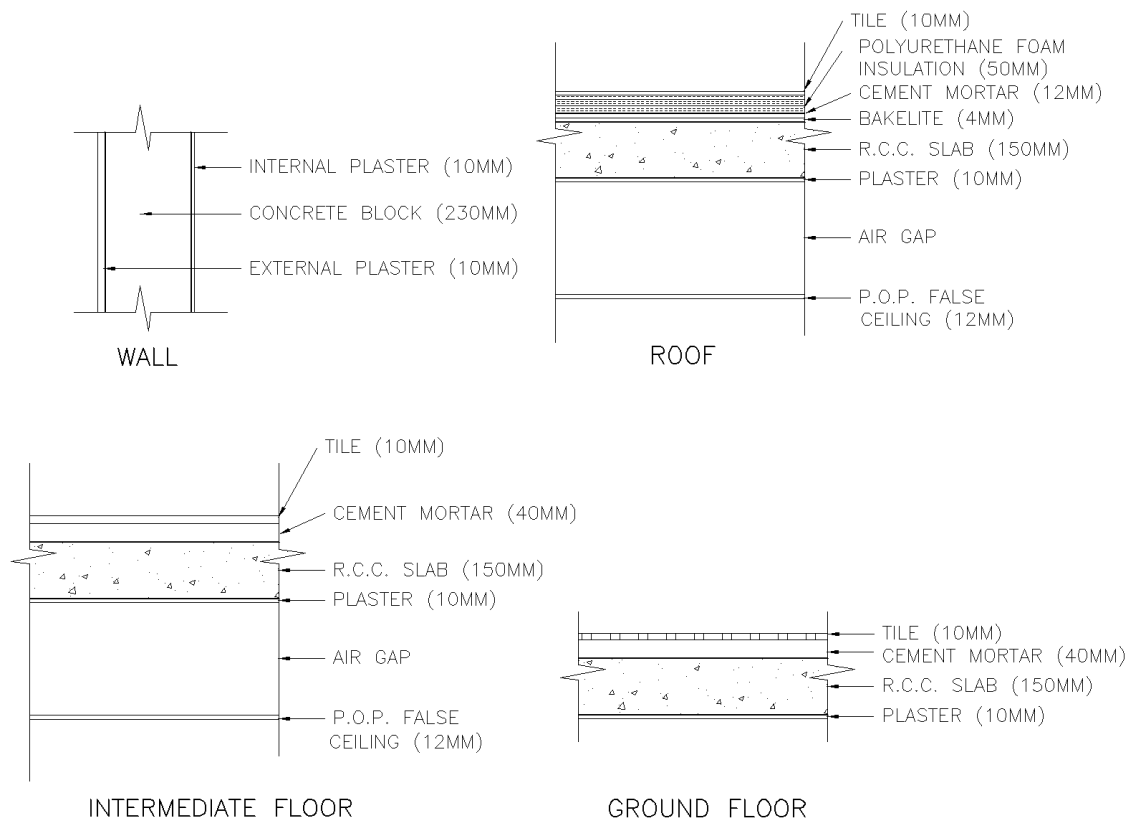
Cross section of typical wall, roof and floor of the commercial building
